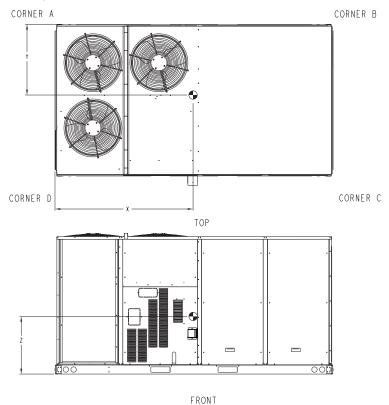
Unit Dimensional Drawing - 16 Size Unit (cont.)
